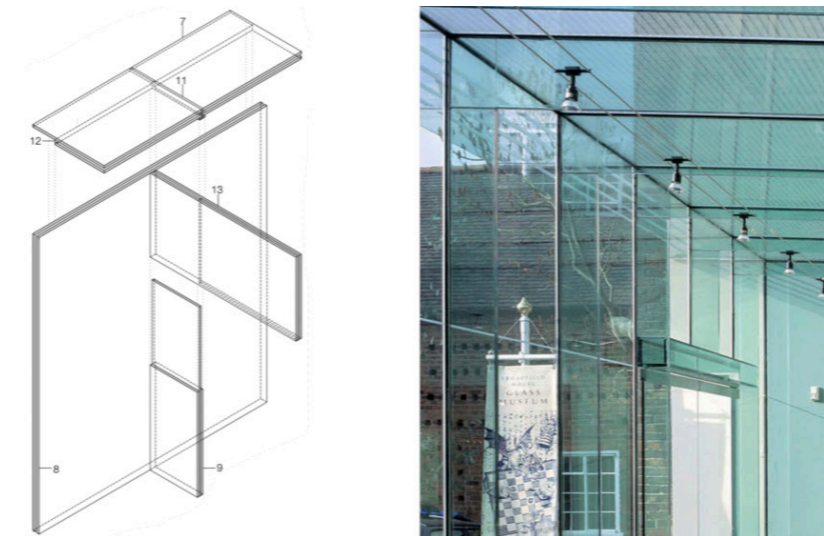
Adhesively bonded float glass fins. From "Glass Construction Manual" (2nd ed., p 309), by Schittich, Staib, Balkow, Schuler, & Sobek. (2007).
